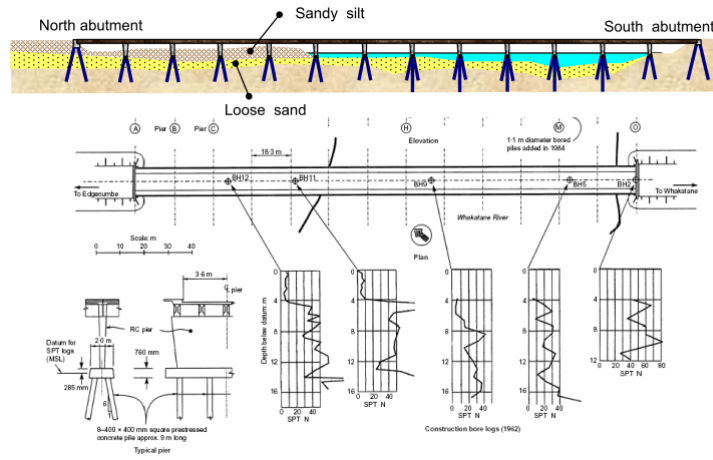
Plan of the Lading Road Bridge (after Berrill et al. [8])
